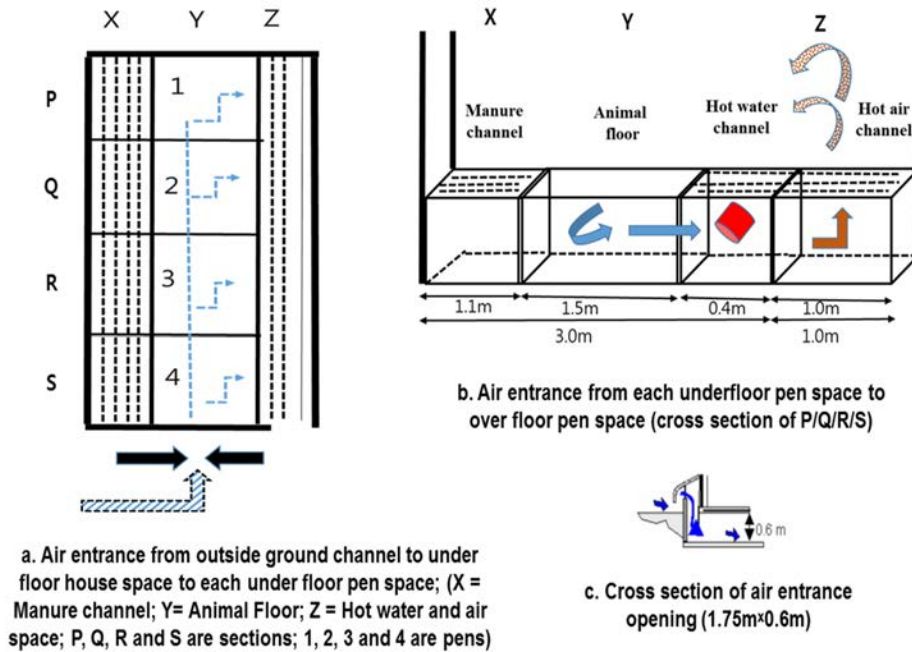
Detail structure and air flow pattern of ground channel ventilation and airflow design (GCA) of experimental pig house: a) air entrance from outside ground channel to under floor house space and under floor pen space; b) air entrance from each underfloor pen space to over floor pen space and c) cross section of air entrance opening
